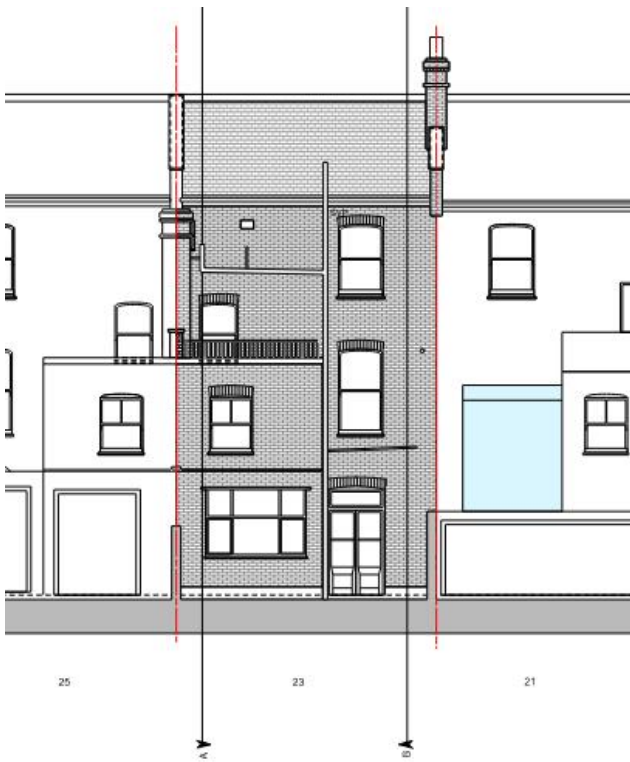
(above): Existing rear elevation (source: Existing drawings)
